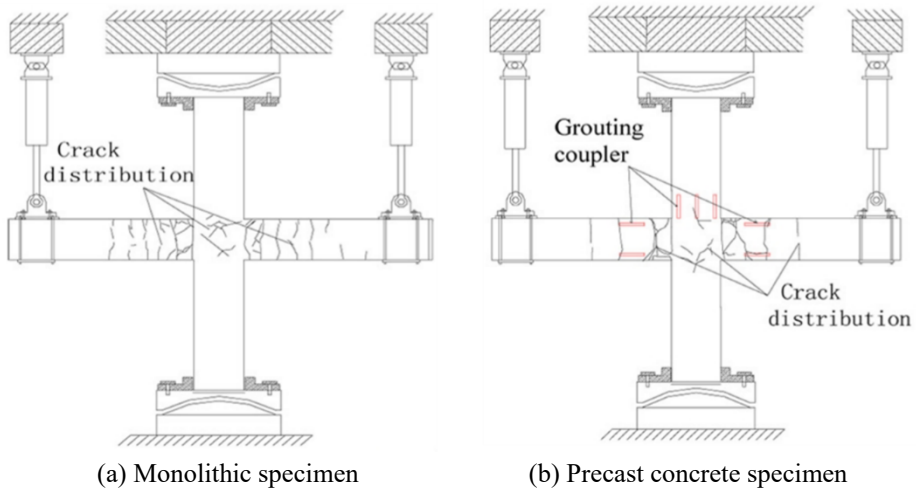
Different crack patterns of beam-column connection specimens in Lui et al. (2016)
